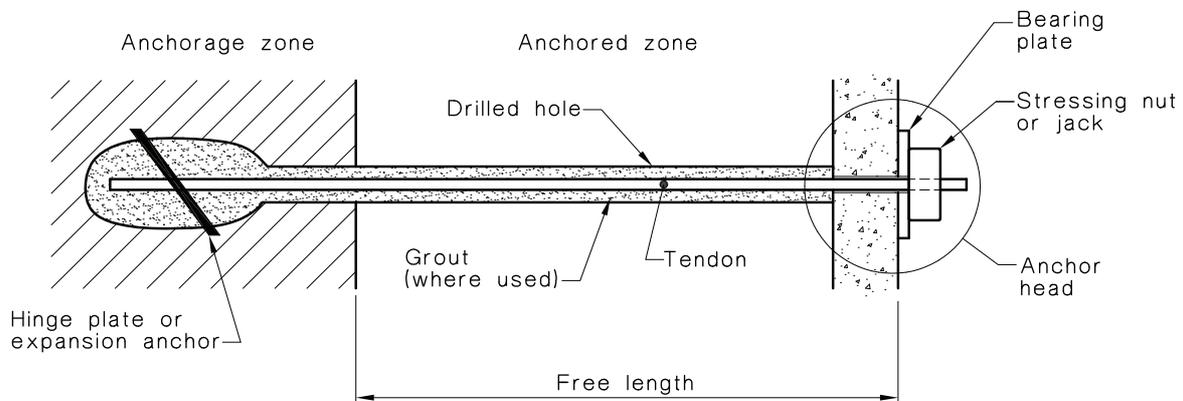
GROUND ANCHOR TERMINOLOGY (MECHANICAL ANCHORAGE)
